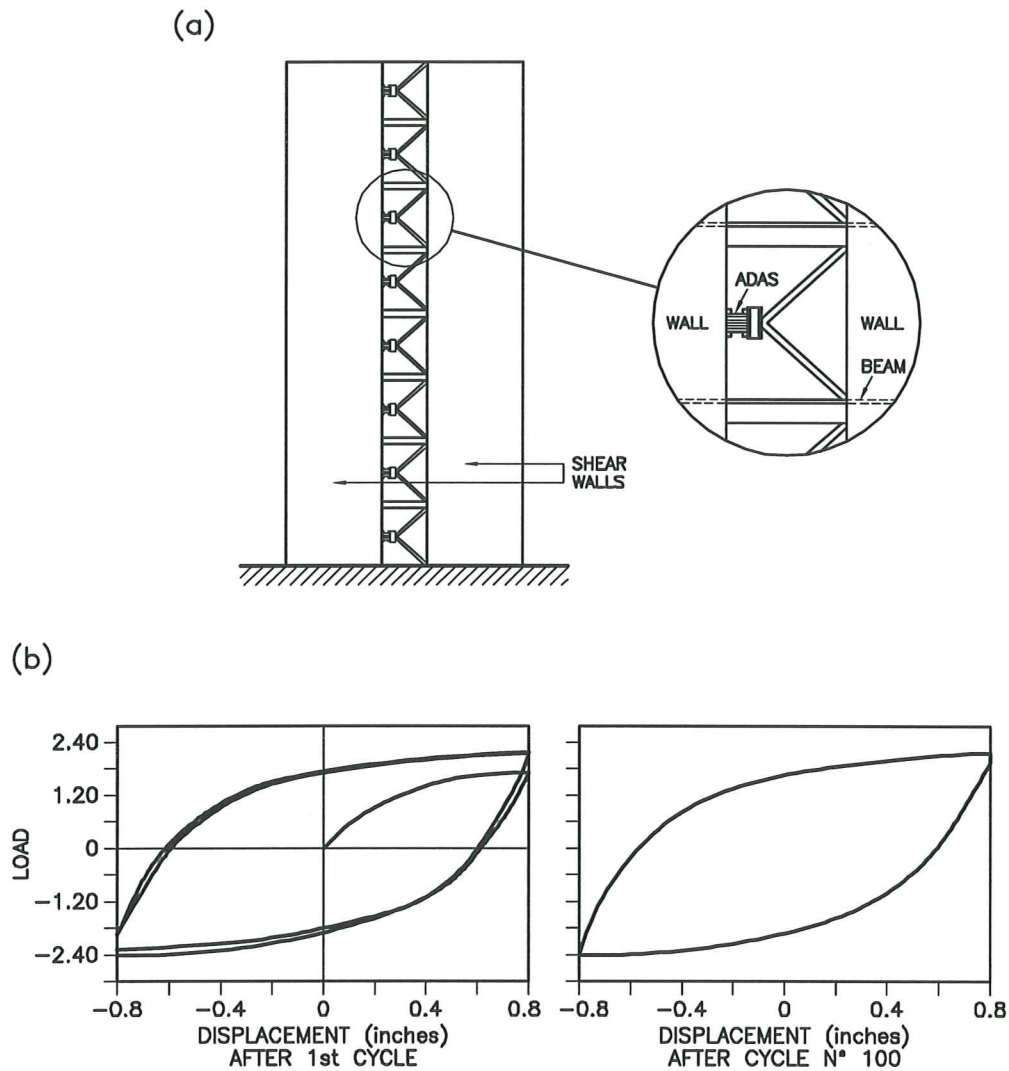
(a) Localisation of an ADAS system in reinforced concrete walls.
